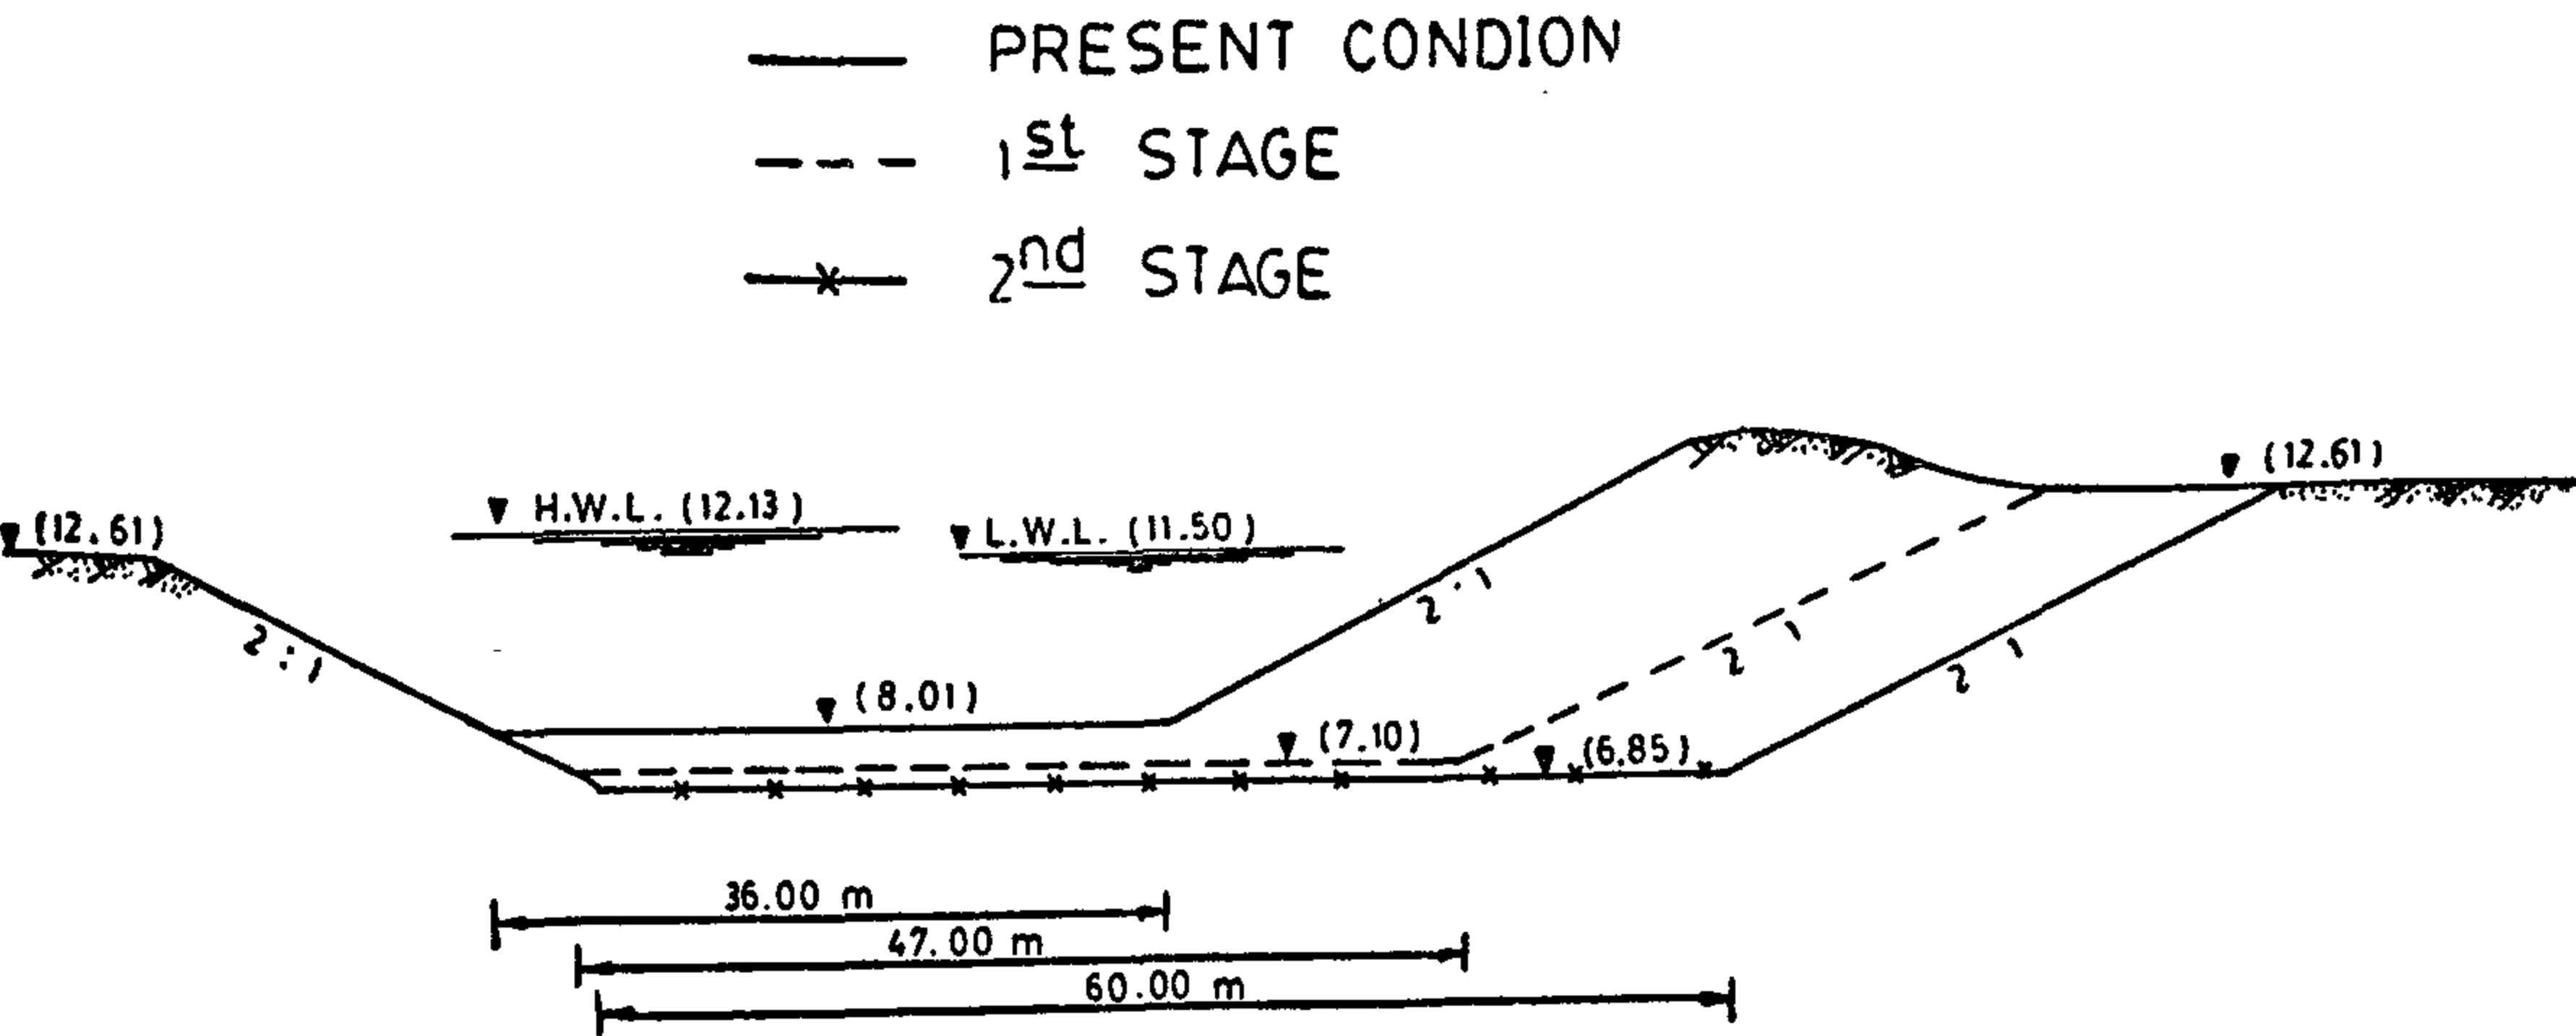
Ismailia Canal Cross Section at Km. 41 (This Section Represent the Canal Cross-section From Km. 37.8 to Km. 46).
